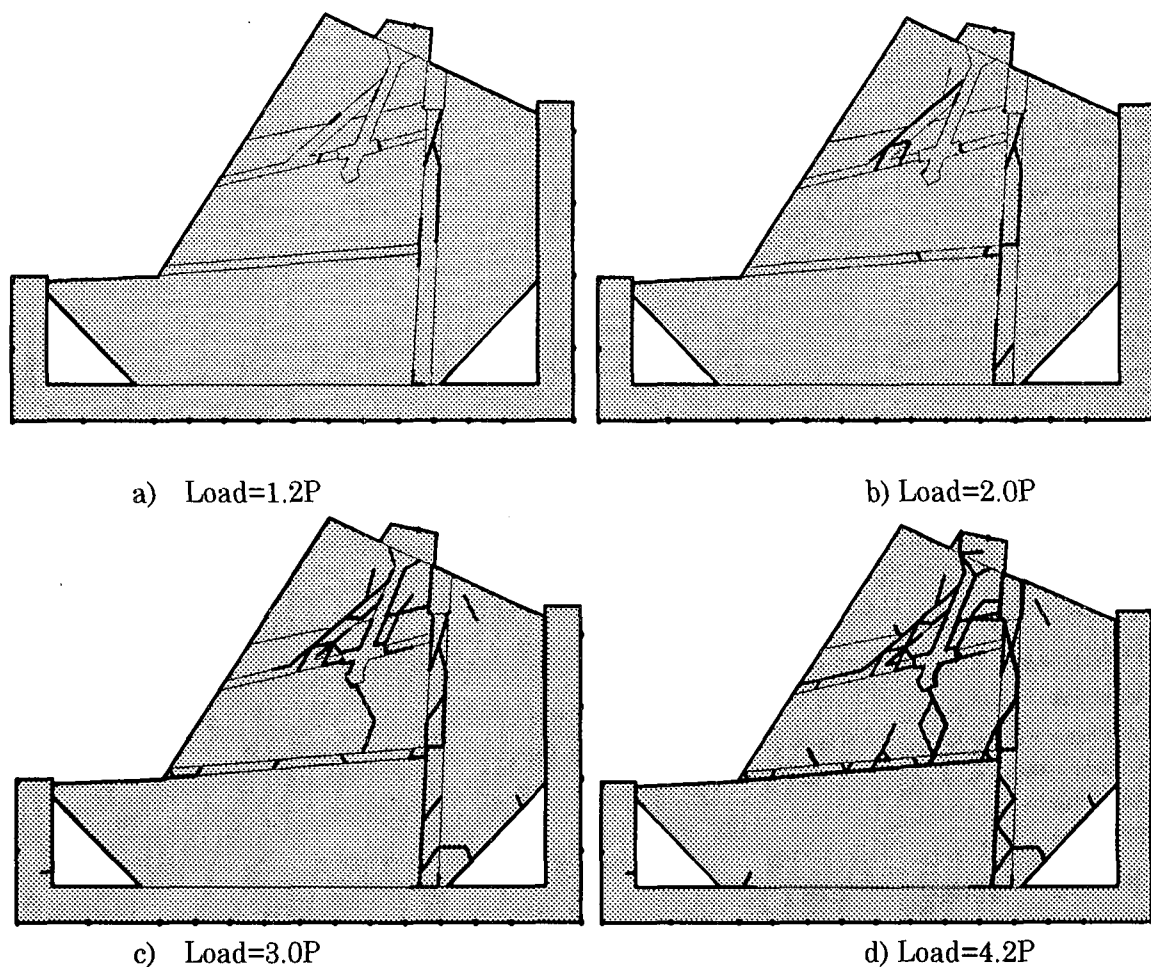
The failure of abutment after strengthened by 3.5m concrete wall
